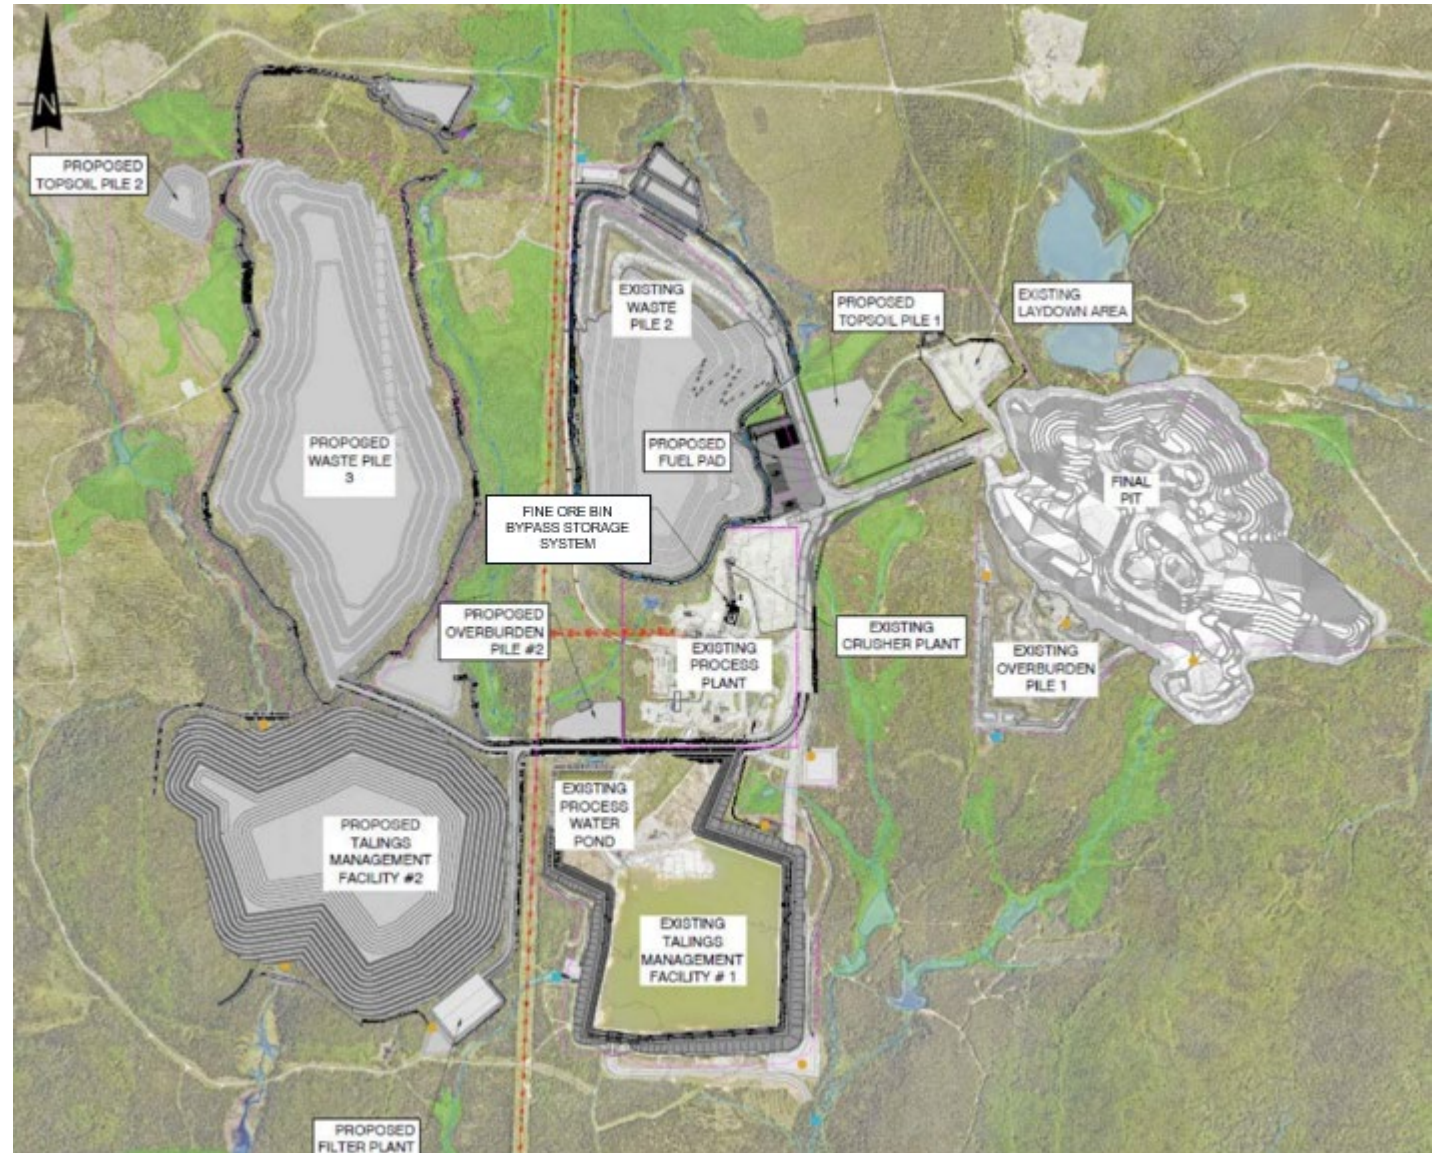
NAL Site Layout Schematic (DFS 2023)
